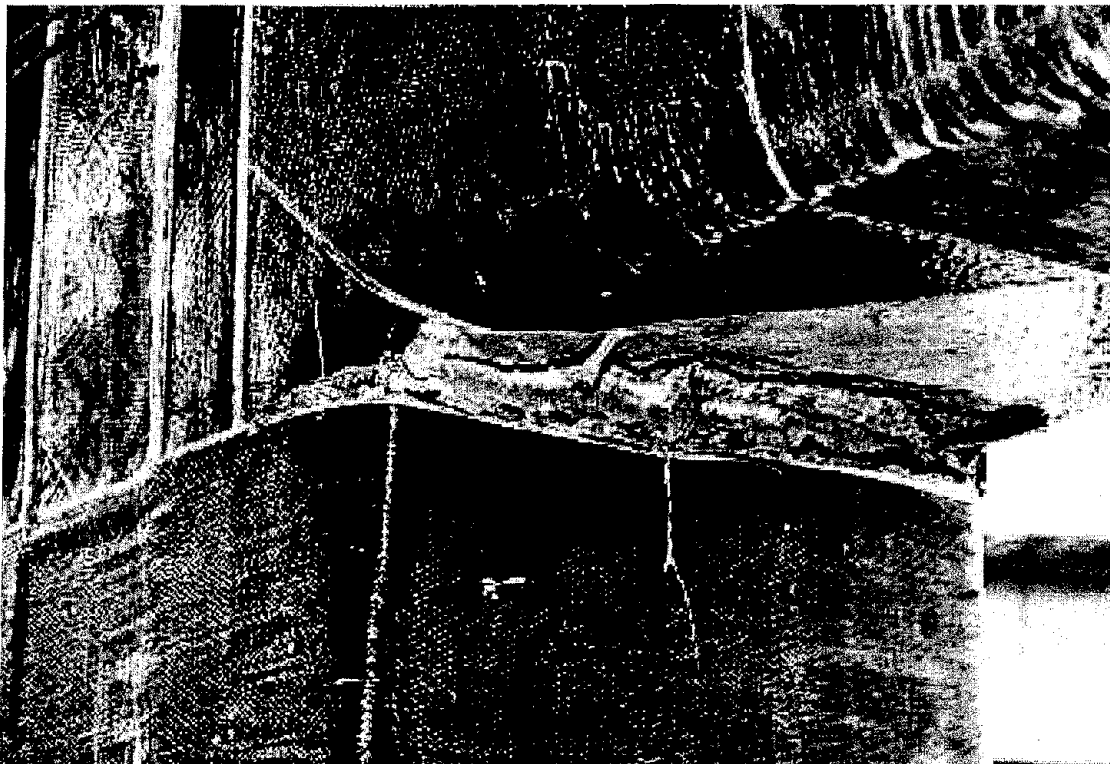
Cracking at the beam cap-column interface of Bent #6
